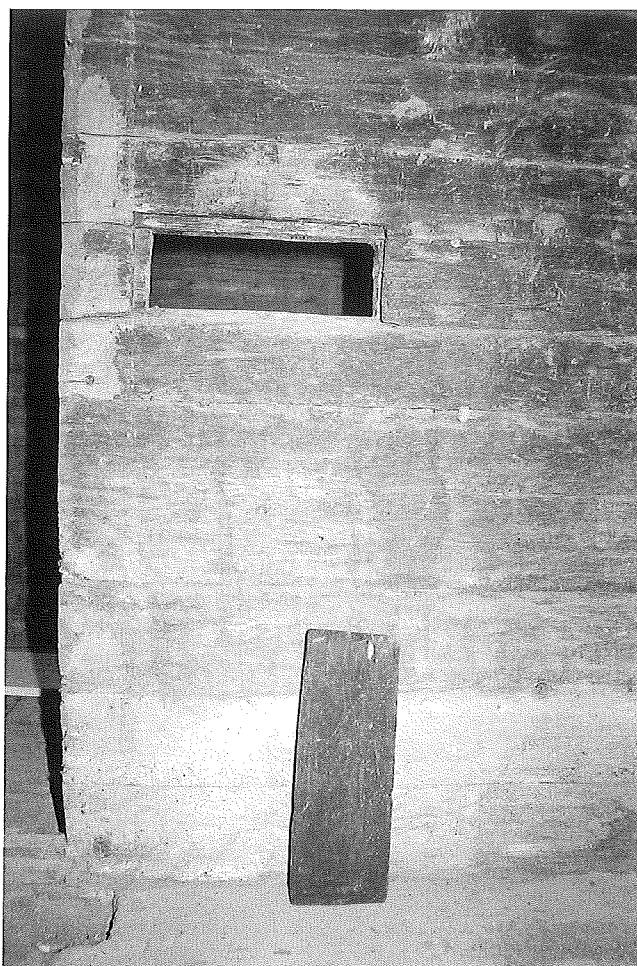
Living room window, port in side wall of house; insertable cover board. Schwyz, Ibach, 1336d. Photo B. Furrer 1995.
